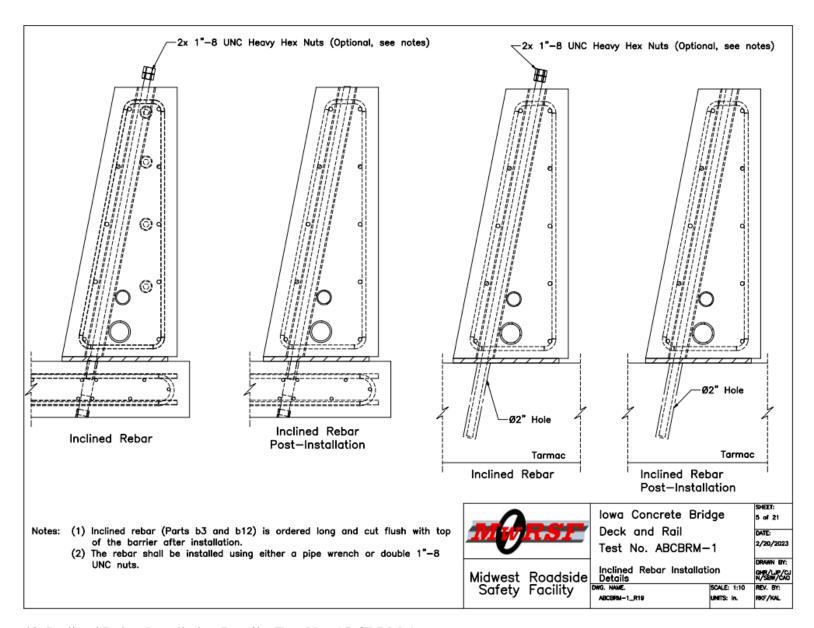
Inclined Rebar Installation Details, Test No. ABCBRM-1
